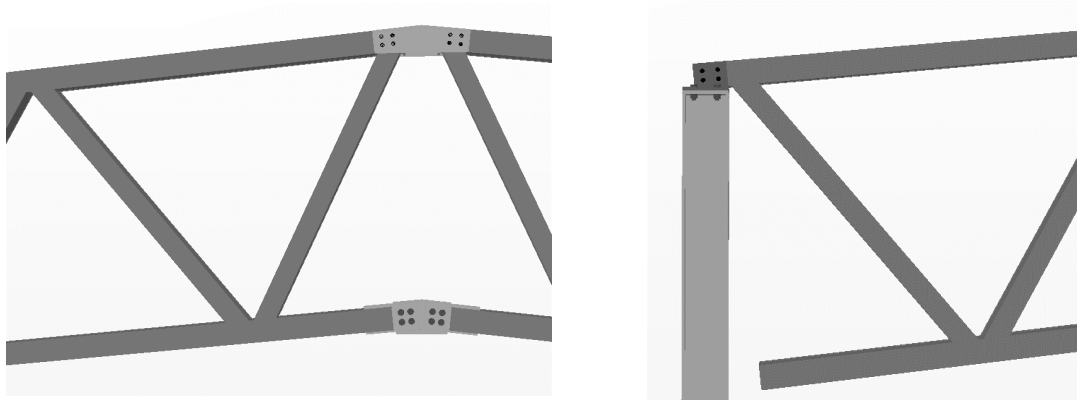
Connectors enabling truss assembly to different slopes.[138]
